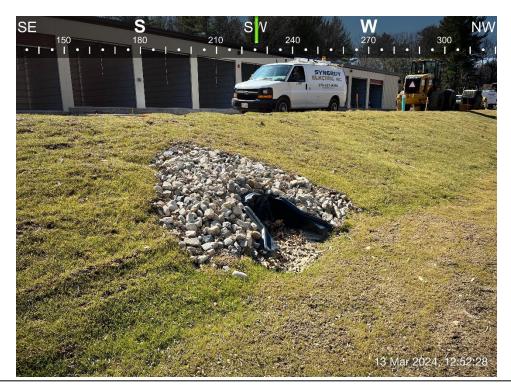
Inlet/outlet FES to Chamber System #1 (one of two inlet/outlets)
